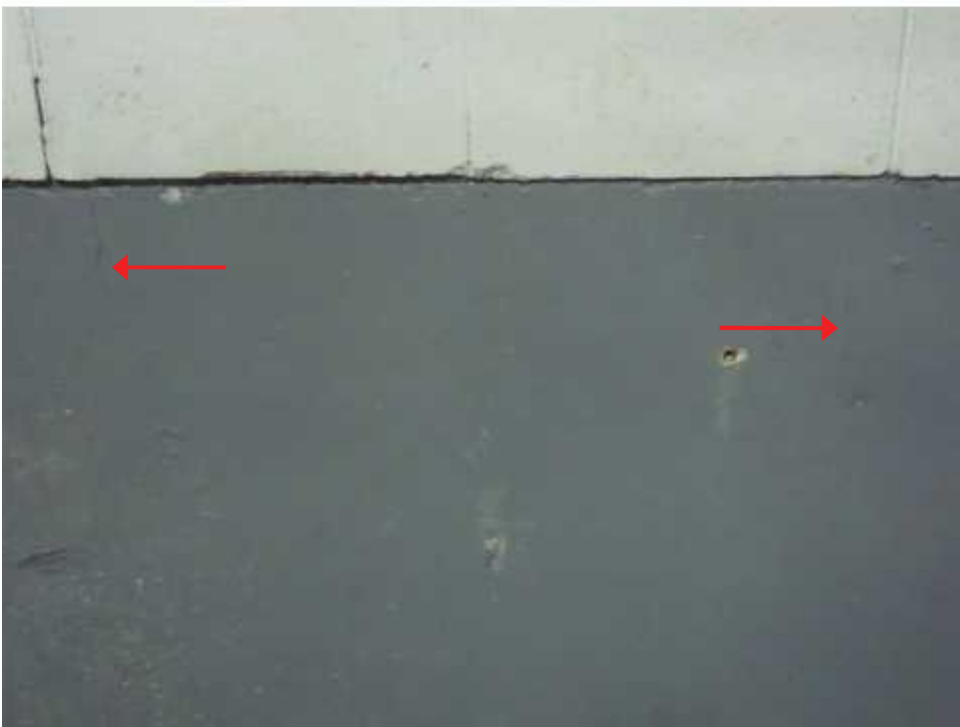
Minor cracking in the retaining section of the north-eastern wall.
